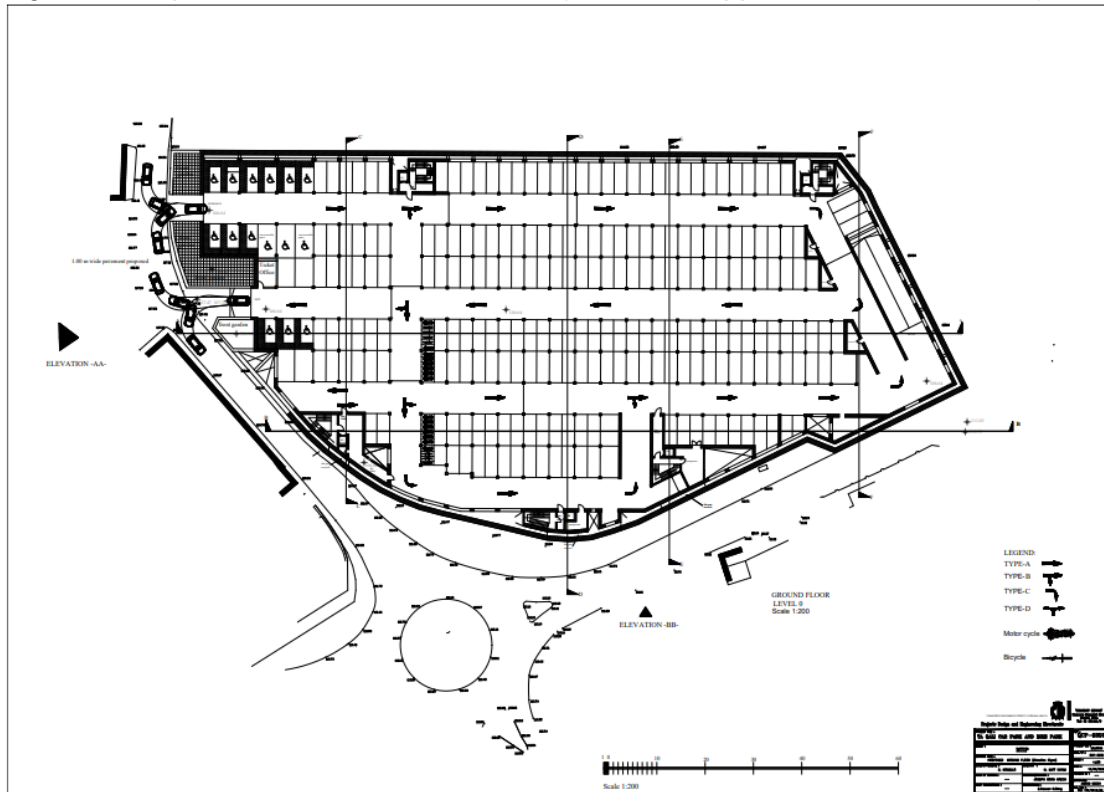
Proposed Ground floor plan (Source: E-apps doc PA2262/20/67c)
